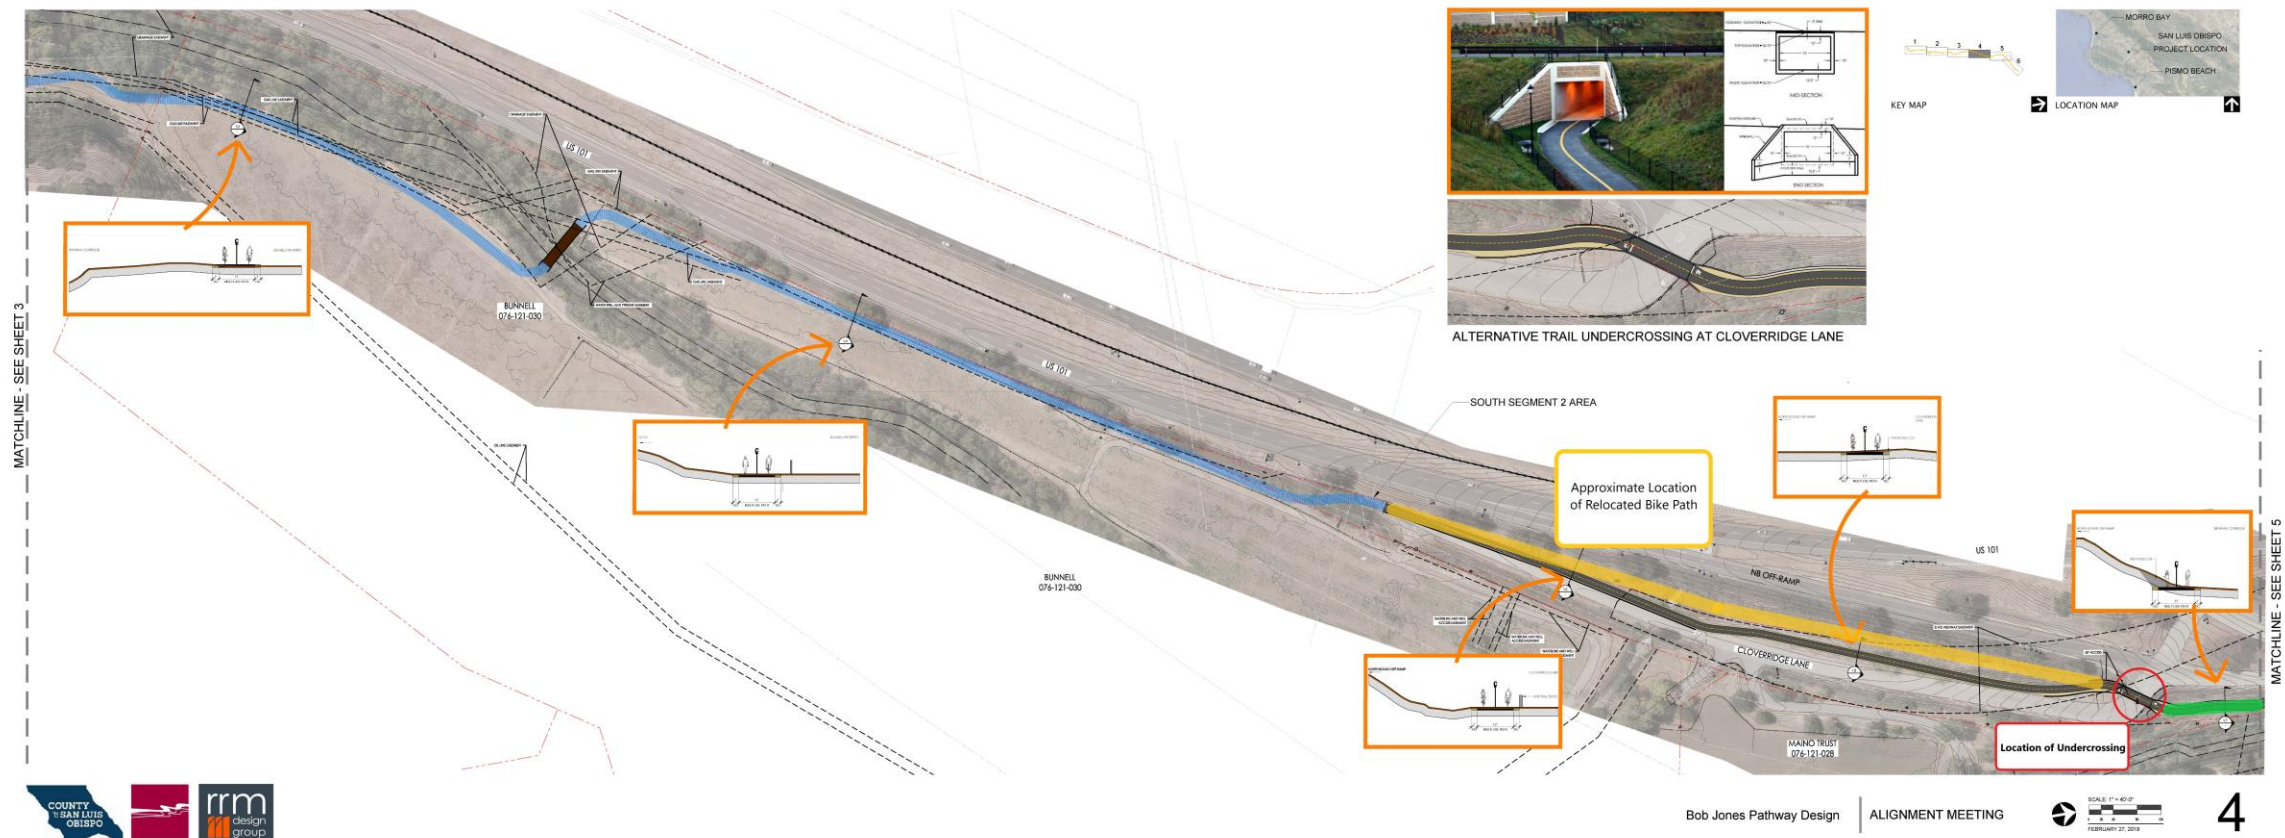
Proposed Revisions from Conceptual Design Plans Sheet 4
